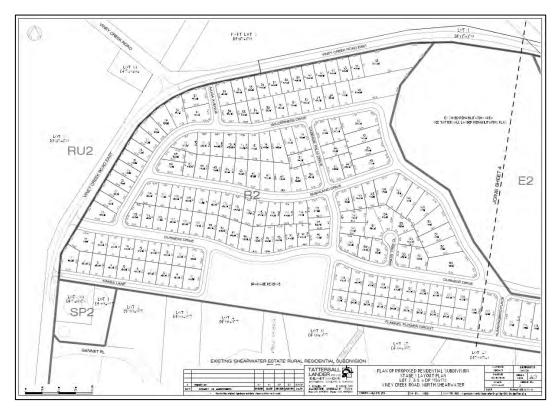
Tattersall Lander Plan Stages One and Two planned subdivision
